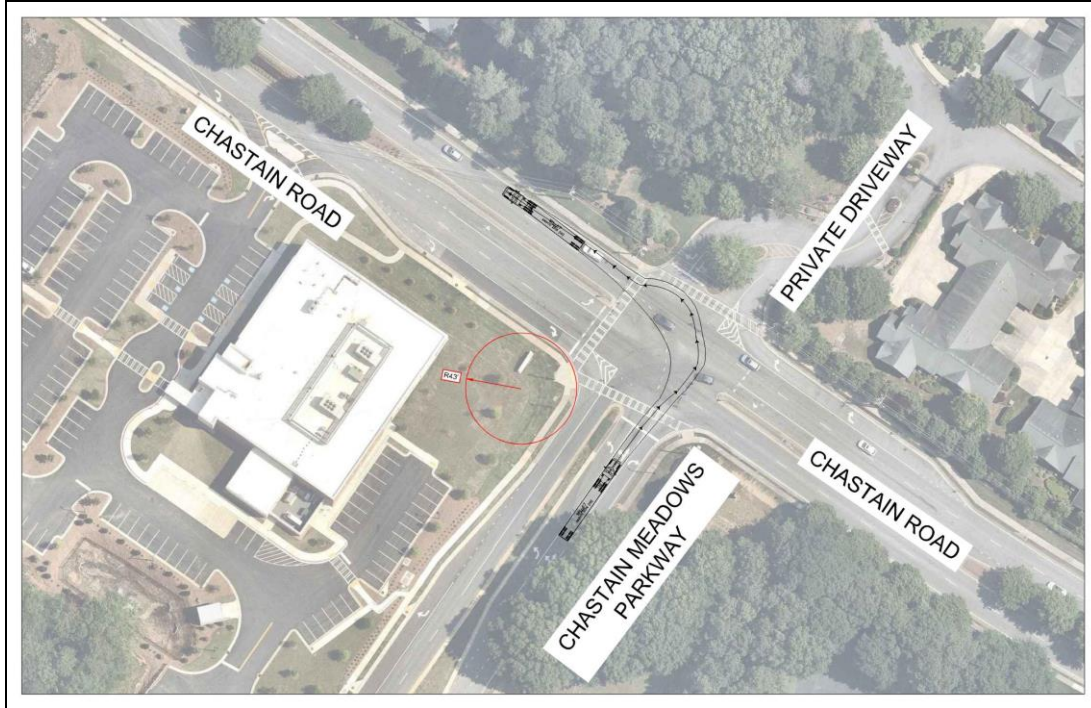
Chastain Road at Chastain Meadows Parkway/Private Driveway – Northbound Left (Exiting Truck)
